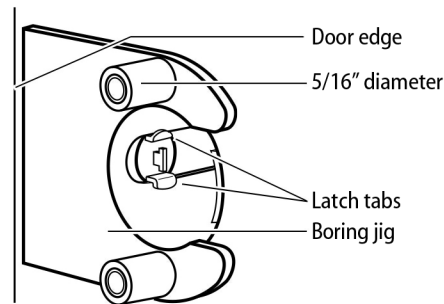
Positioning the boring jig for drilling the 5/16" holes
